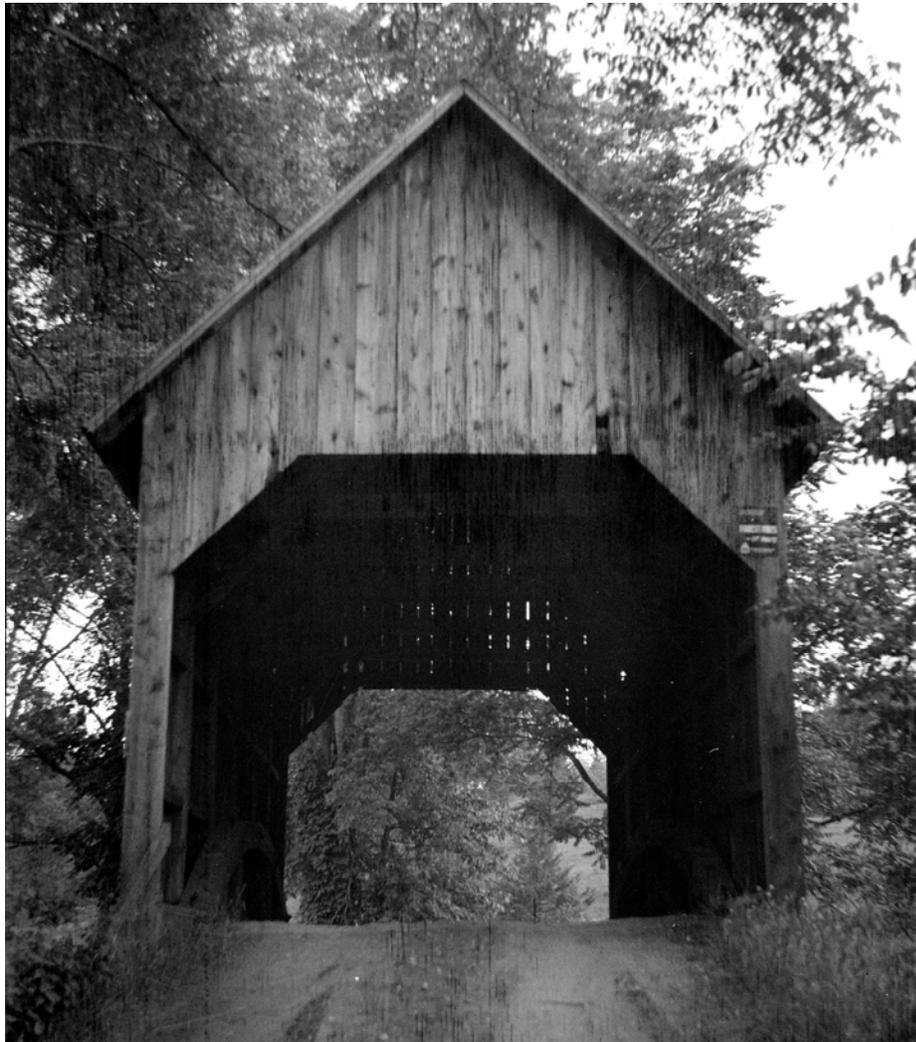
East portal elevation of bridge. Photograph courtesy Richard Sanders Allen Collection, June 27, 1940.
